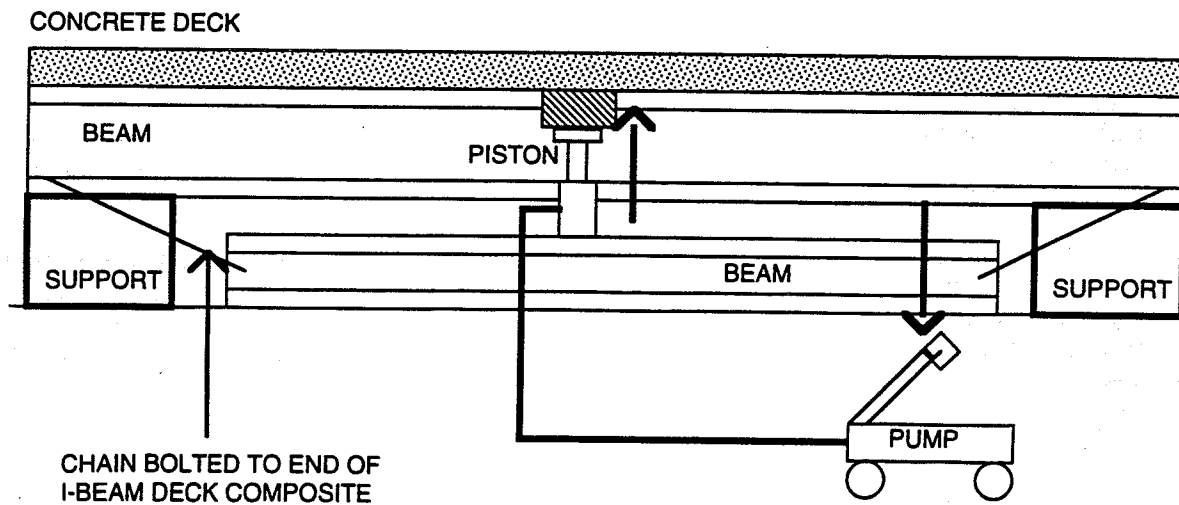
drawing of experimental testing test set-up to test concrete decks in bending
